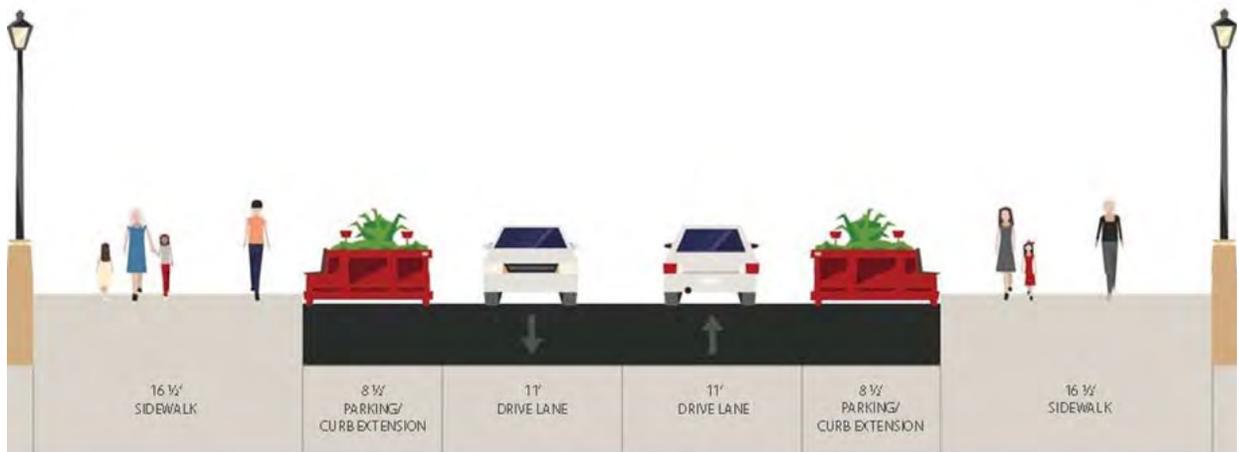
PROPOSED SECTION OF ELM STREET BRIDGE
